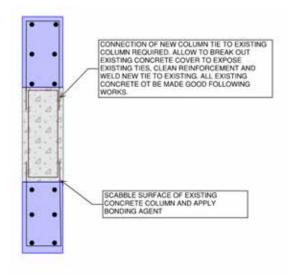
Column Strengthening of Internal Columns at Hotel Rooms
